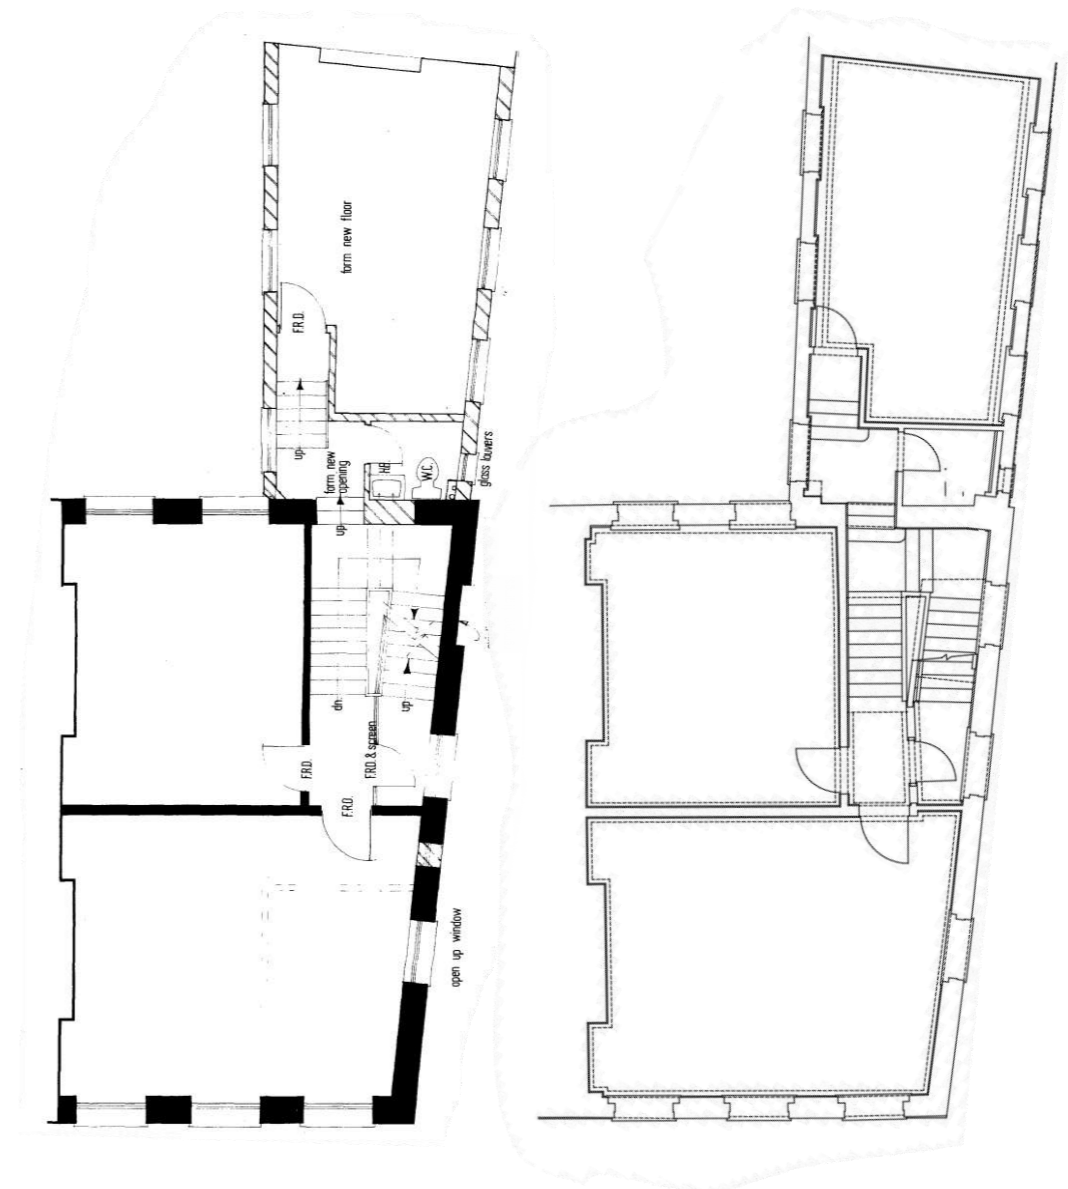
Second Floor, 1970 plan (left) and existing plan (right).
